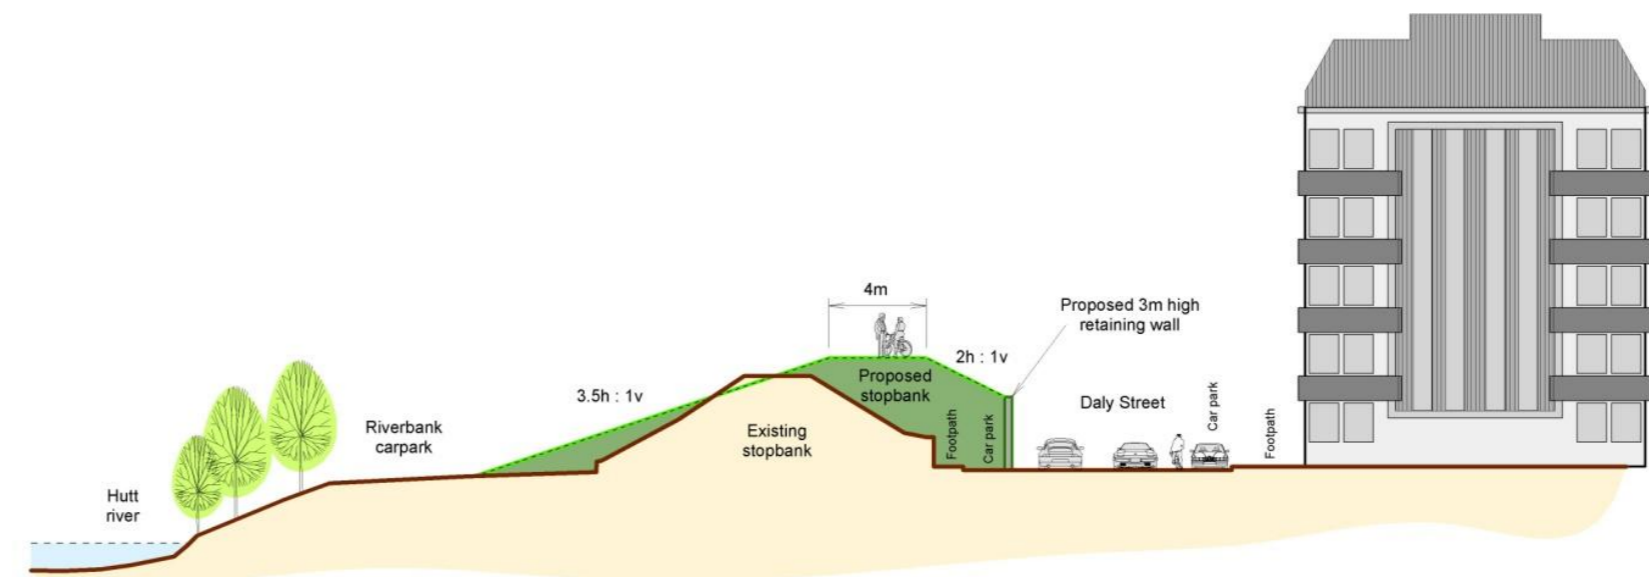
Indicative stop bank cross-section at Daly Street (new in green) which shows a retaining wall edge
